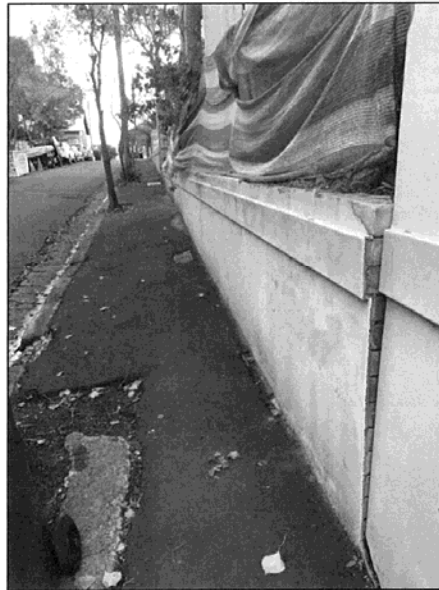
Showing wall damage opposite Tree 3, 4, 5 & 7.
